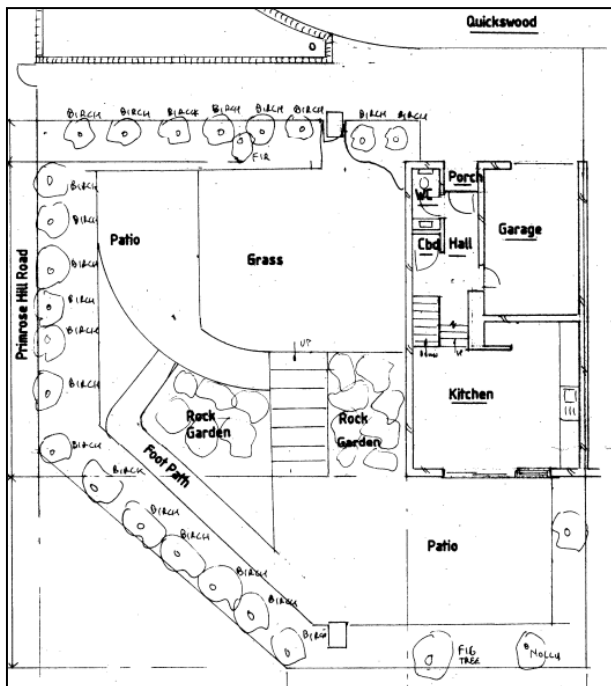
(above): Existing site and ground floor plan at 65 Quickswood (before the approved development commenced). This plan shows the large setback of the building from the junction of Adelaide Road and Primrose Hill Road. The noticeable gap was much greater than the existing gap at the appeal site.
